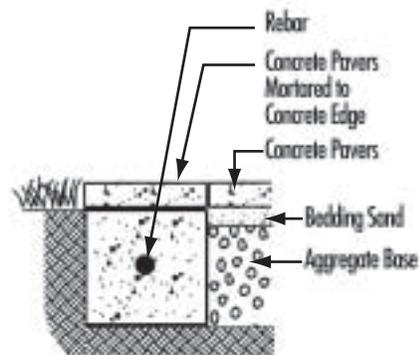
Submerged concrete curb with pavers fastened to the top with high-strength mortar or bitumen adhesive.
